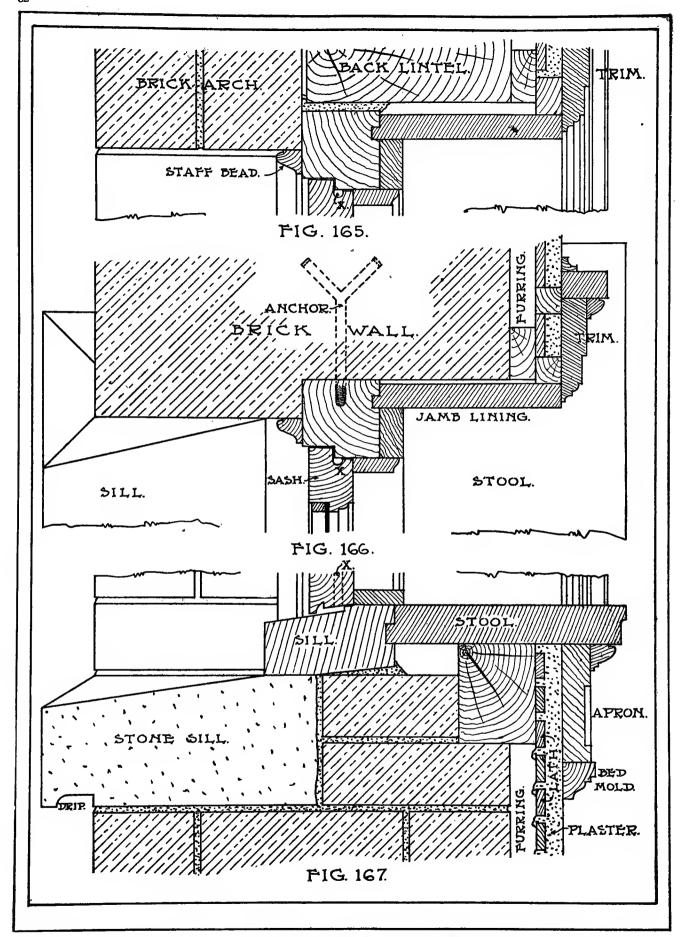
OUTWARD OPENING CASEMENT—IMPROVED CONSTRUCTION
